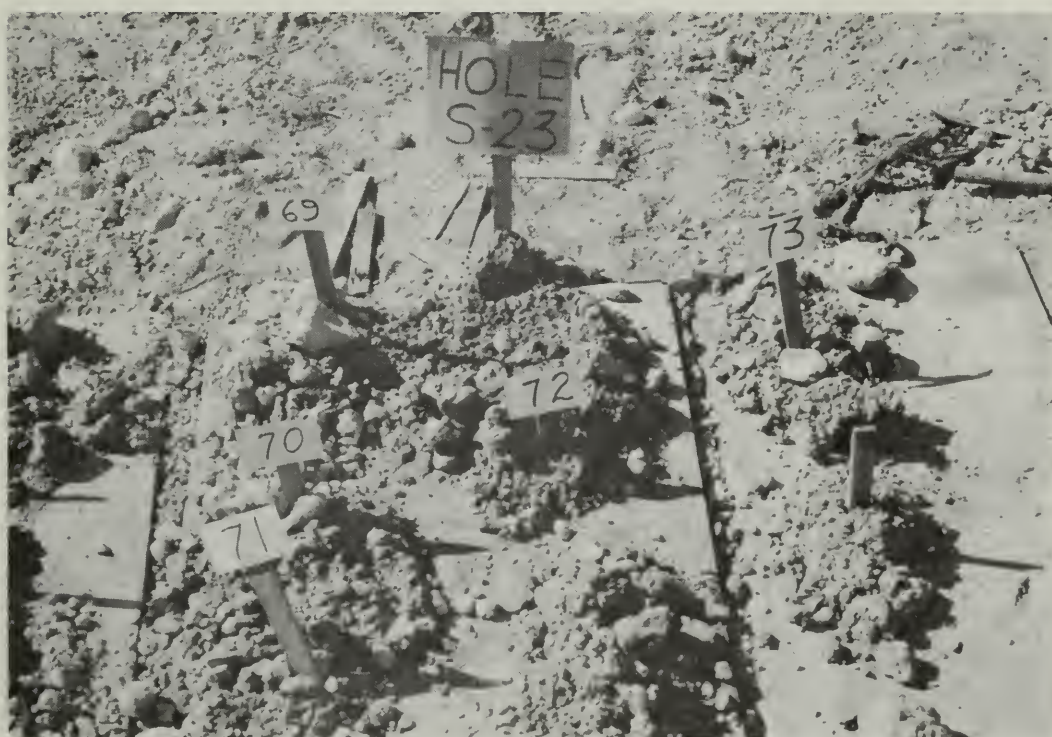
Continuous samples taken by the cable tool drill at hole 23. Sample depths 69 to 74 feet.
